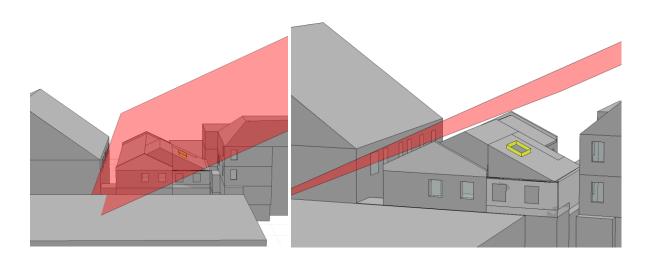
25 degree plane for the No48 Birchington Road building windows
